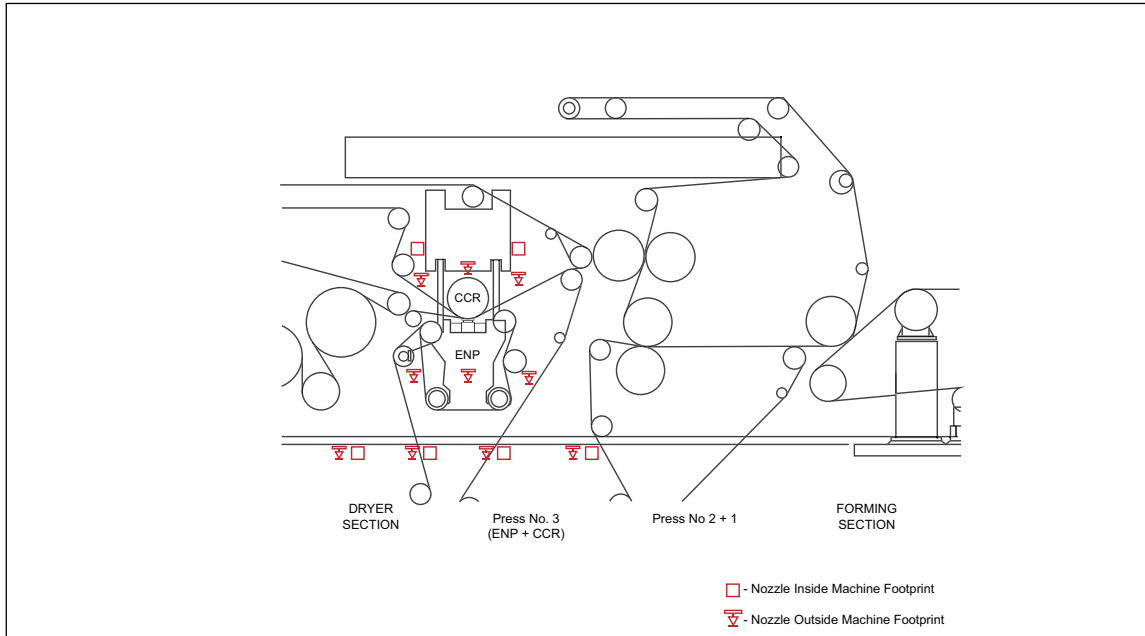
Example nozzle locations for shoe belt or sleeve and flexible hose ruptures (elevation and machine direction)
